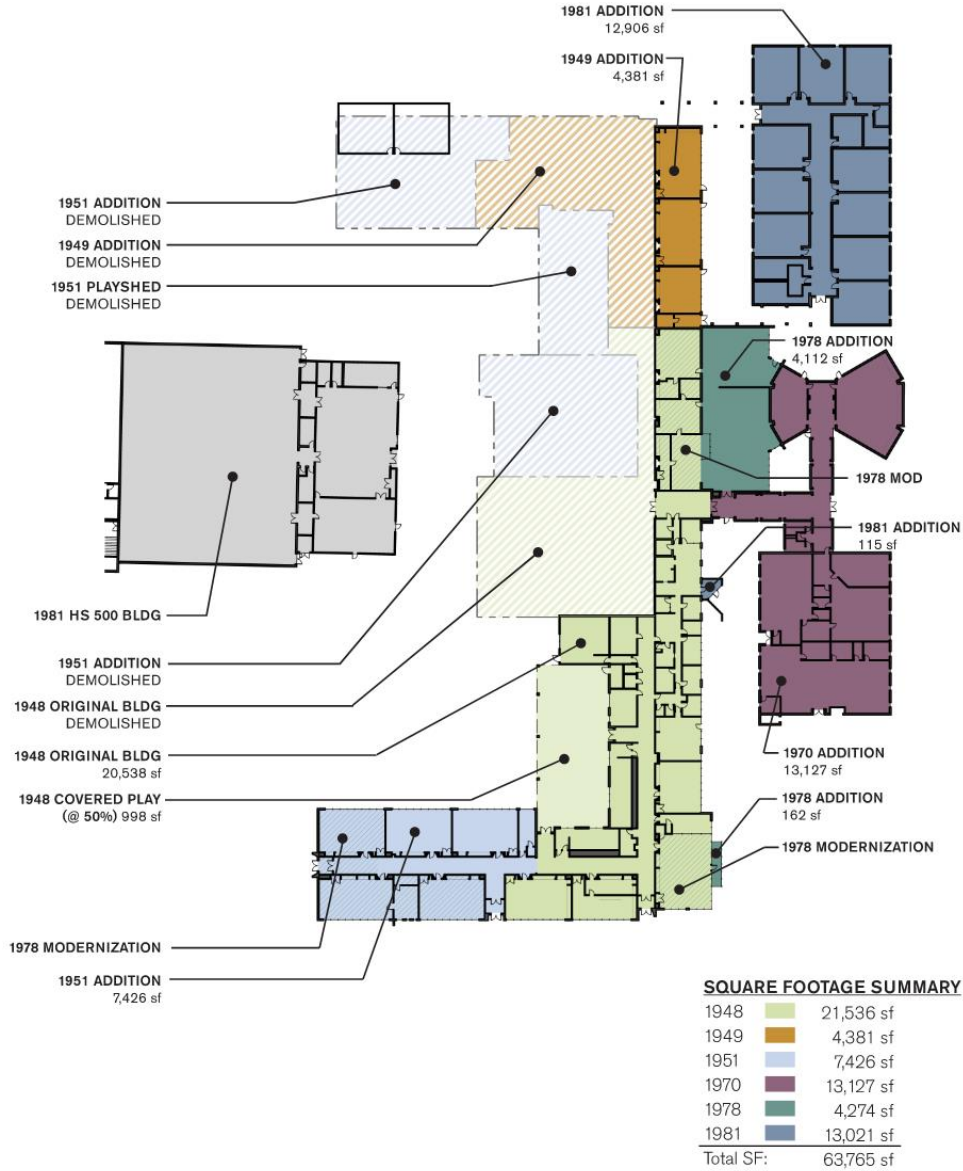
Area plan from ICOS Study and Survey project showing a summary of the years of construction and the square footage of the different building areas at Commodore Options School, Bainbridge Island School District, Washington.
